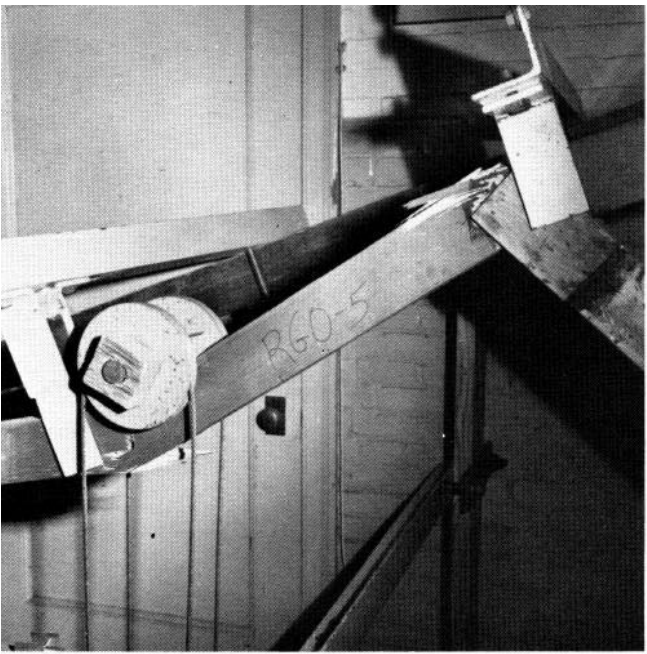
Typical failure of trussed rafter in upper chord over compression member. (M140589-1)
